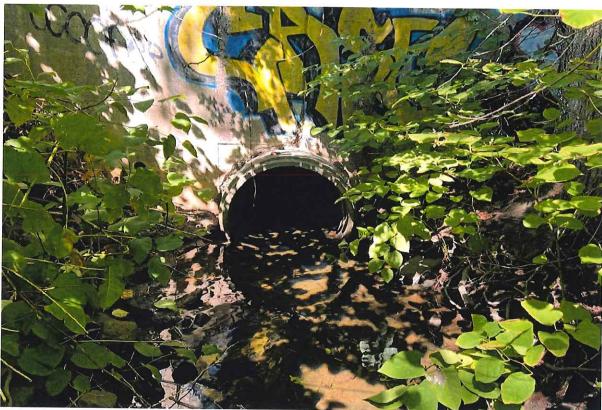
View of culvert outfall and headwall of watercourse at south end of Griswold Shoppes property, looking north.
